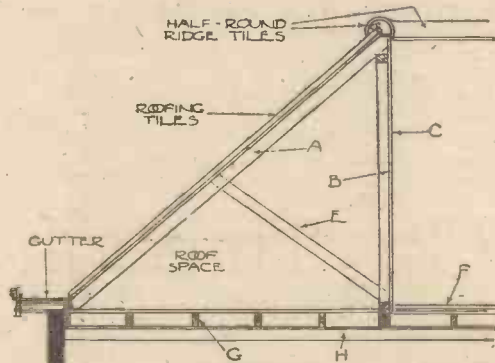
SECTION SHEWING HIDDEN EAVES GUTTER.
